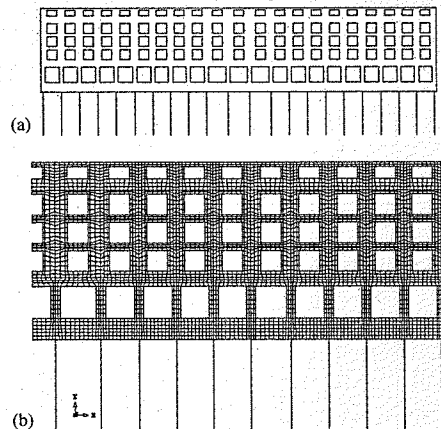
Model of the masonry façade (a) and the finite element mesh used (b).
